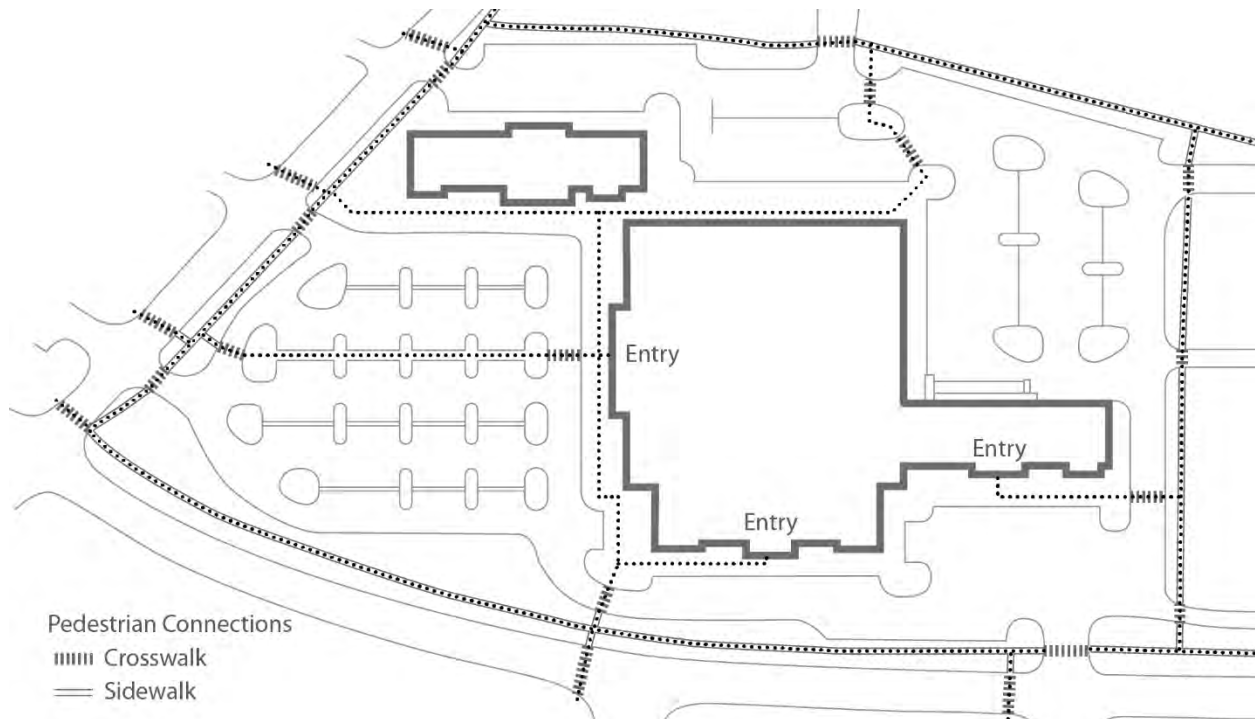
Pedestrian Connection to Perimeter Public Sidewalks
